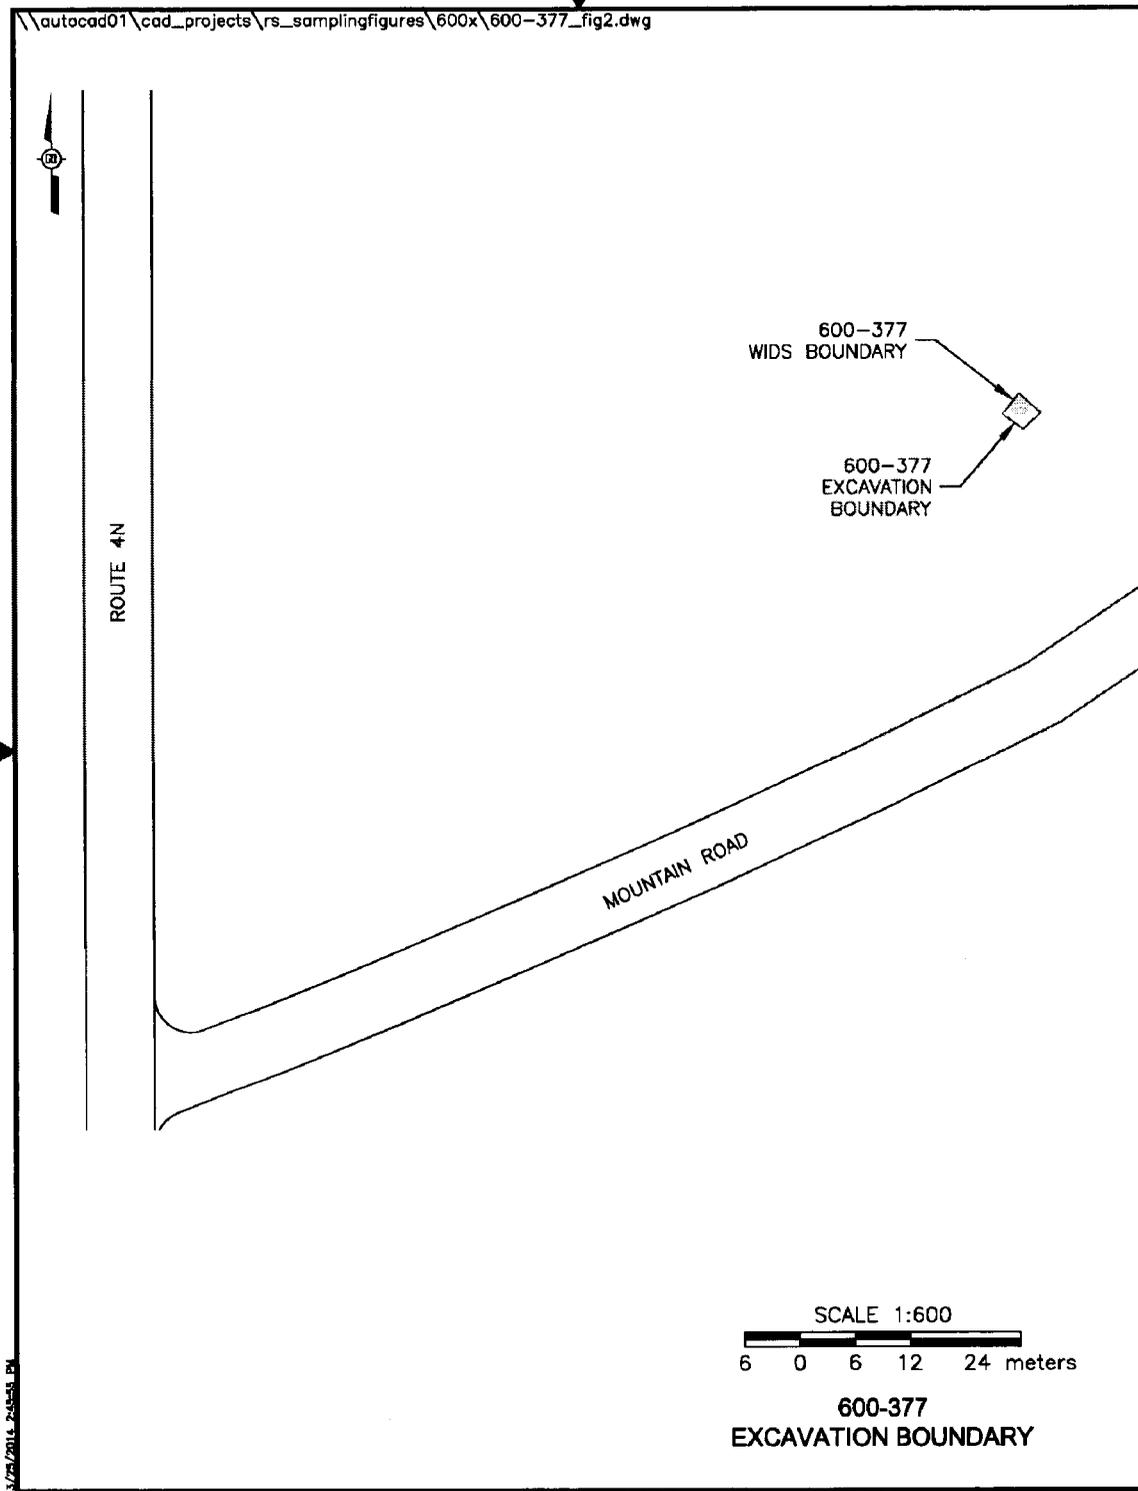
shows the walkaround boundary of the excavation, performed following remediation of the 600-377 waste site.
